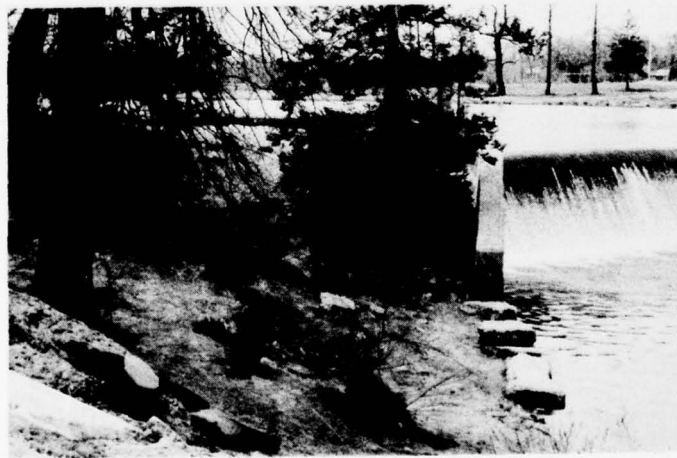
View of the right abutment downstream face, including areas of seepage halfway between tree and end of the wingwall
